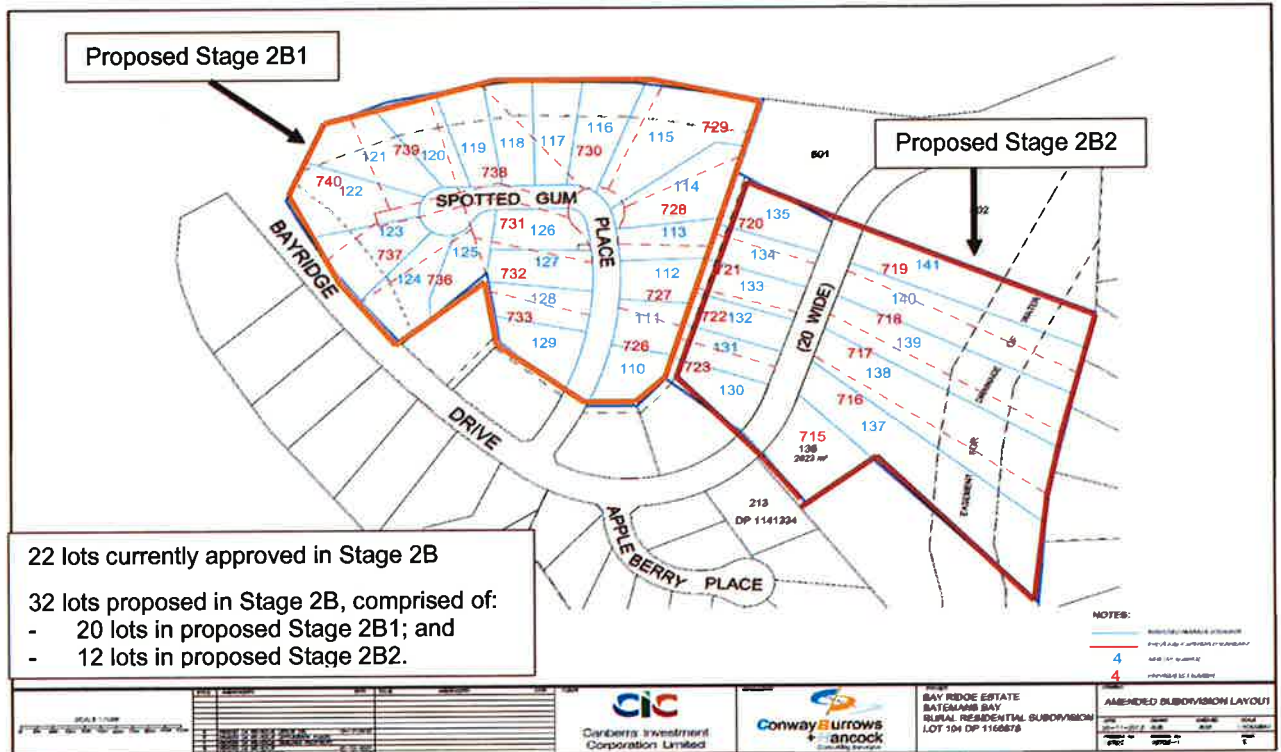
Proposed Revisions to the Layout of Stage 2B (approved lot layout in red, proposed lot layout in blue)
